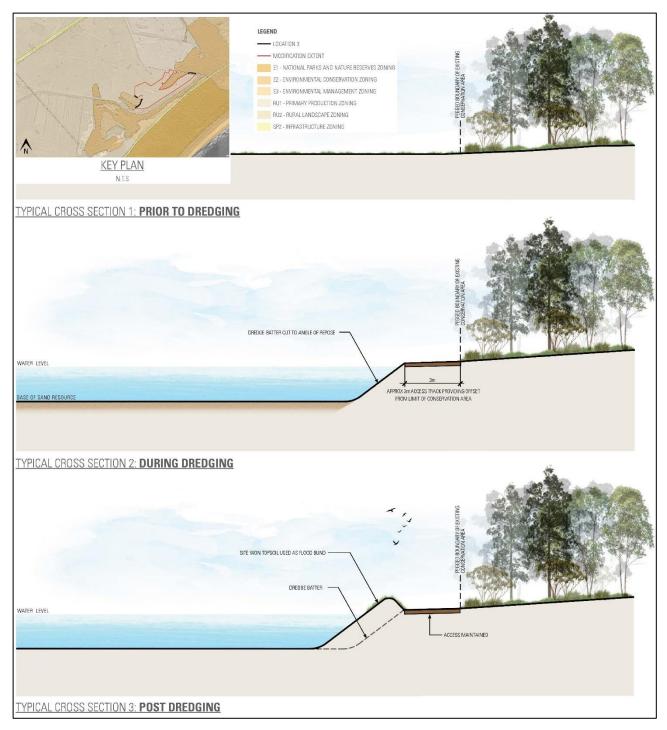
Typical Cross Section adjacent to Conservation Area 4
